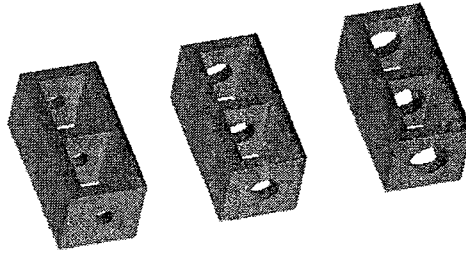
Schematic 3D view of the drilled concrete masonry units
